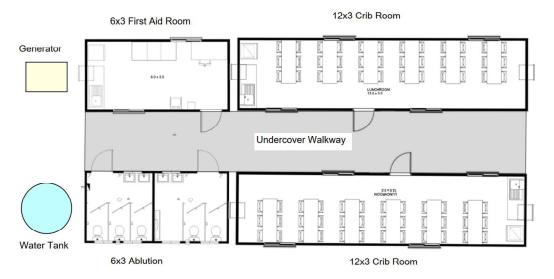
Watsonia Bridge Construction Compound - Indicative Floor Plan
